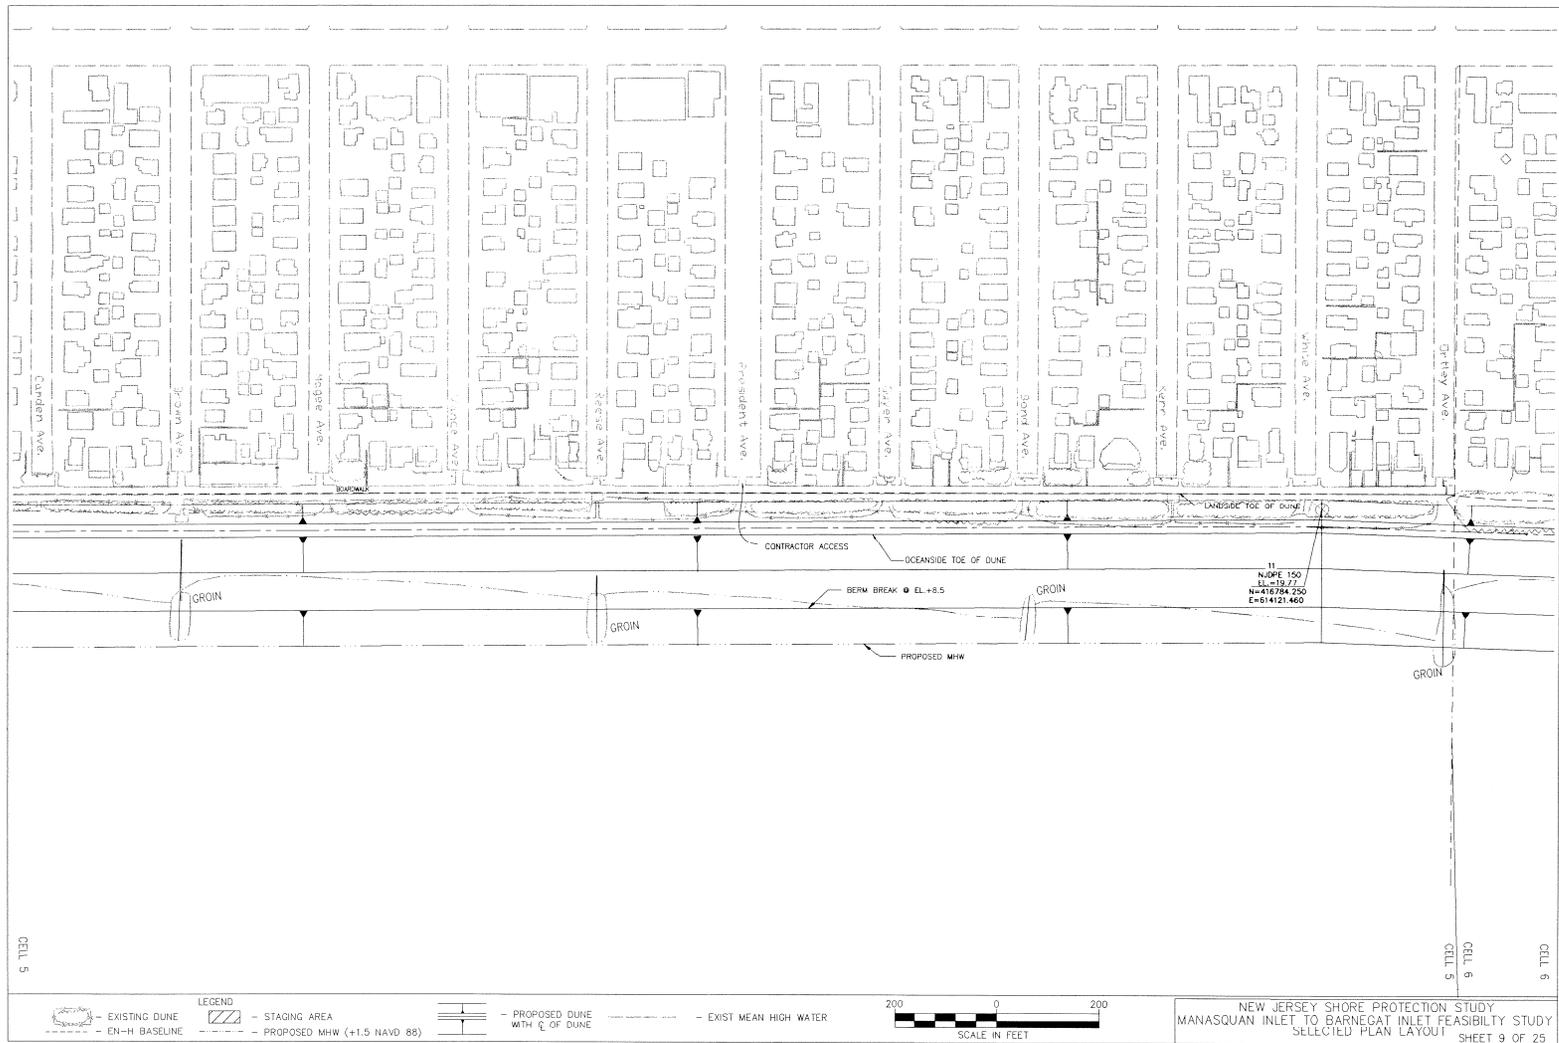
Selected Plan Layout – Lavallette Borough, Camden Avenue to Ortley Avenue
